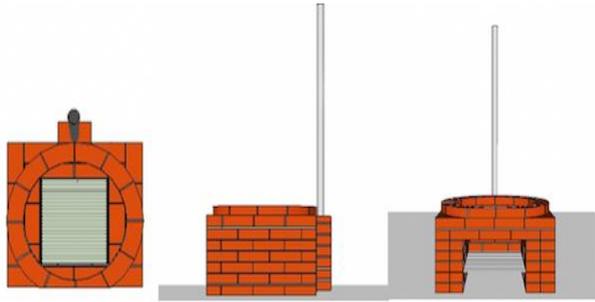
The design of rocket stove : top view (left), side view (middle), front view (right)
